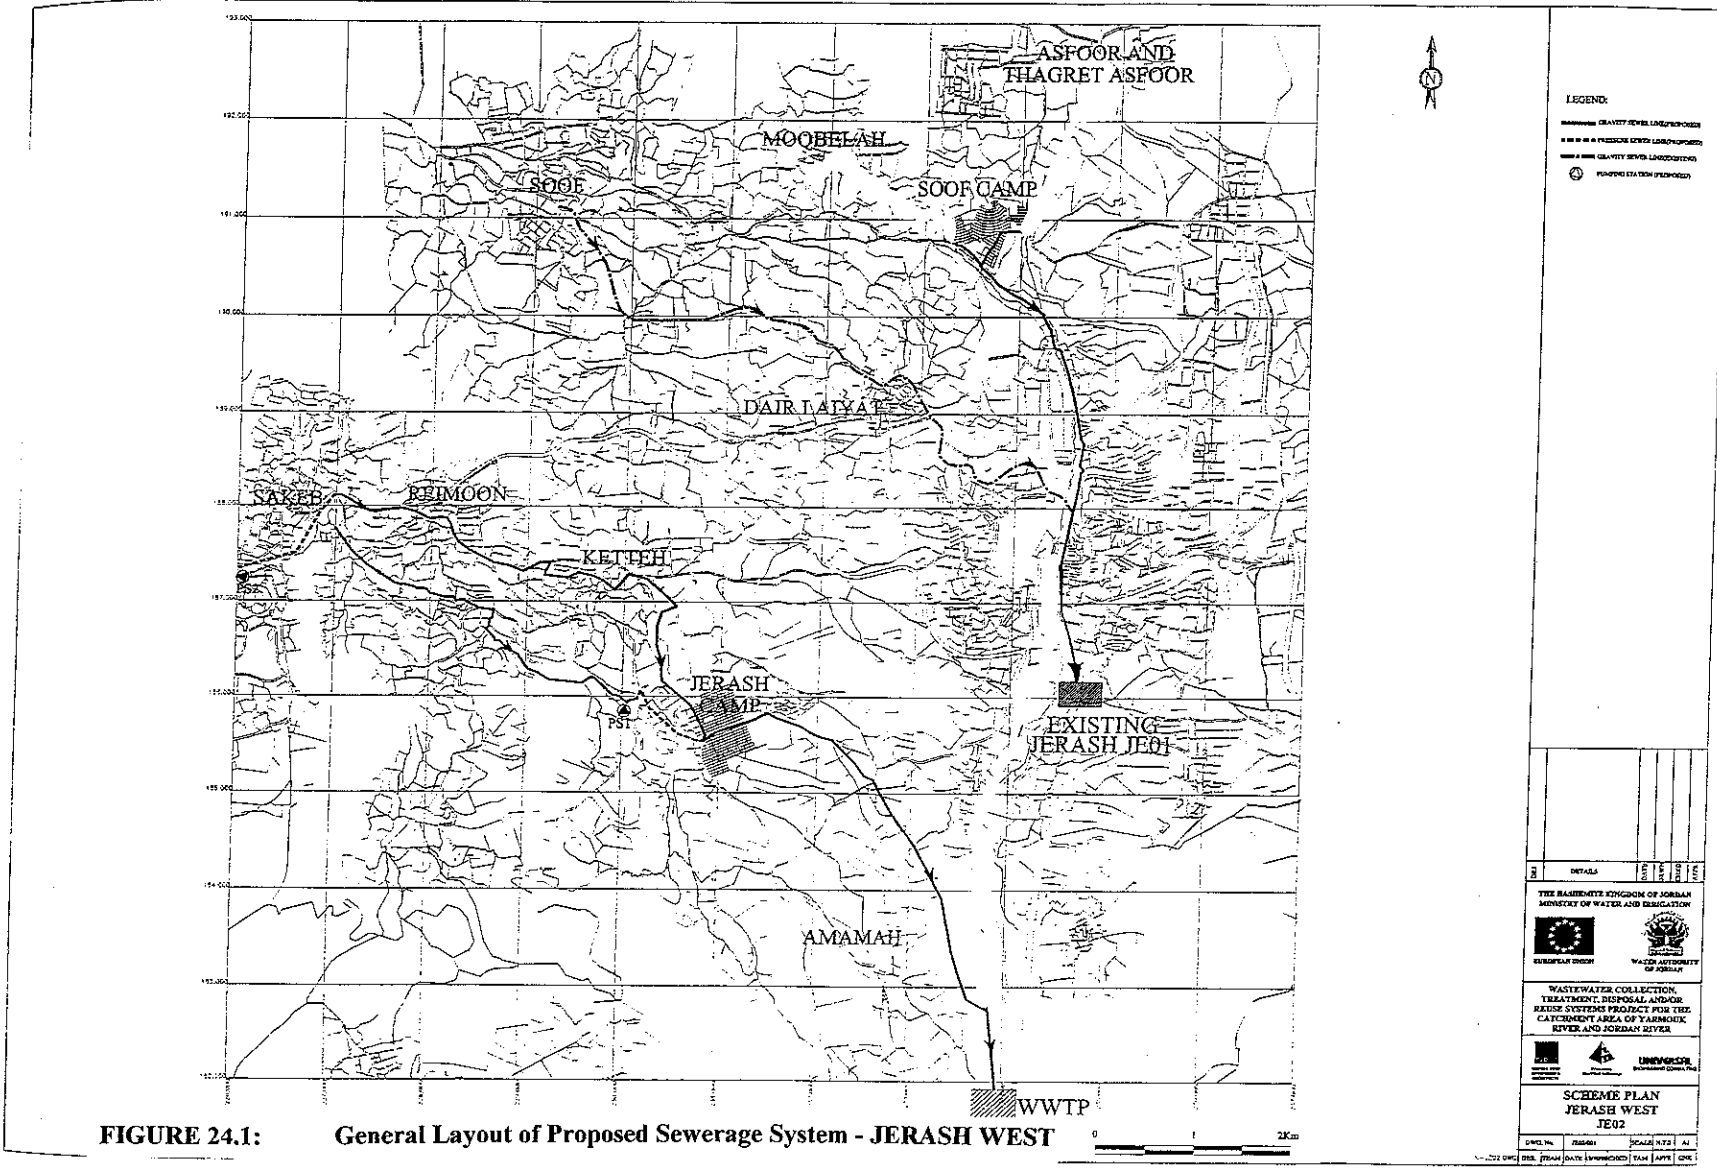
General Layout of Proposed Sewerage System - JERASH WEST
